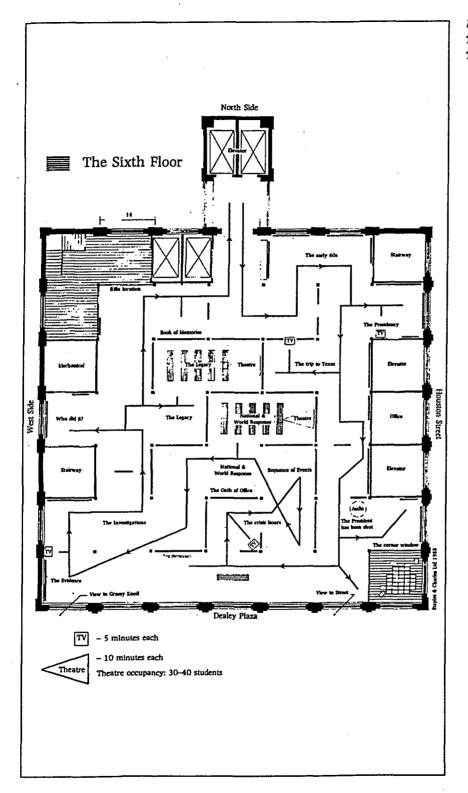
Floor Plan of The Sixth Floor, Dallas, Texas
